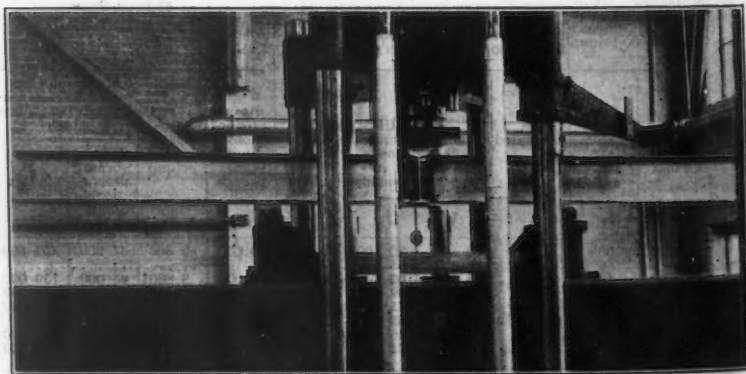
BEAM TEST OF SPECIMEN 4 ON 48-INCH SPAN.
